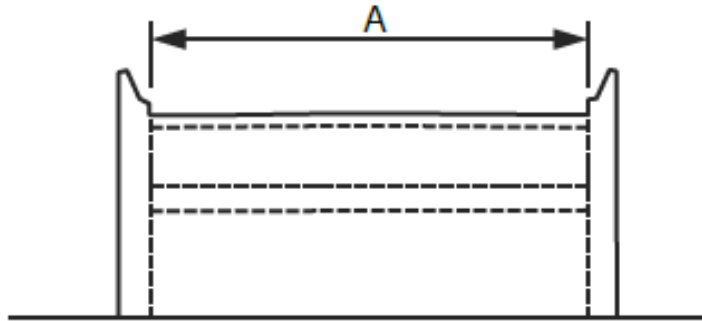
Cross-section view of a filled arch bridge or culvert under fill with headwalls.
